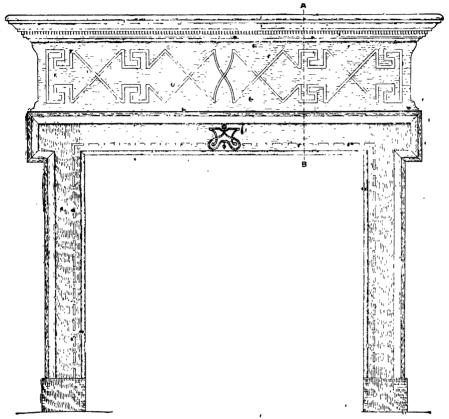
Front Elevation of Chimney-piece with Fret Ornament.
